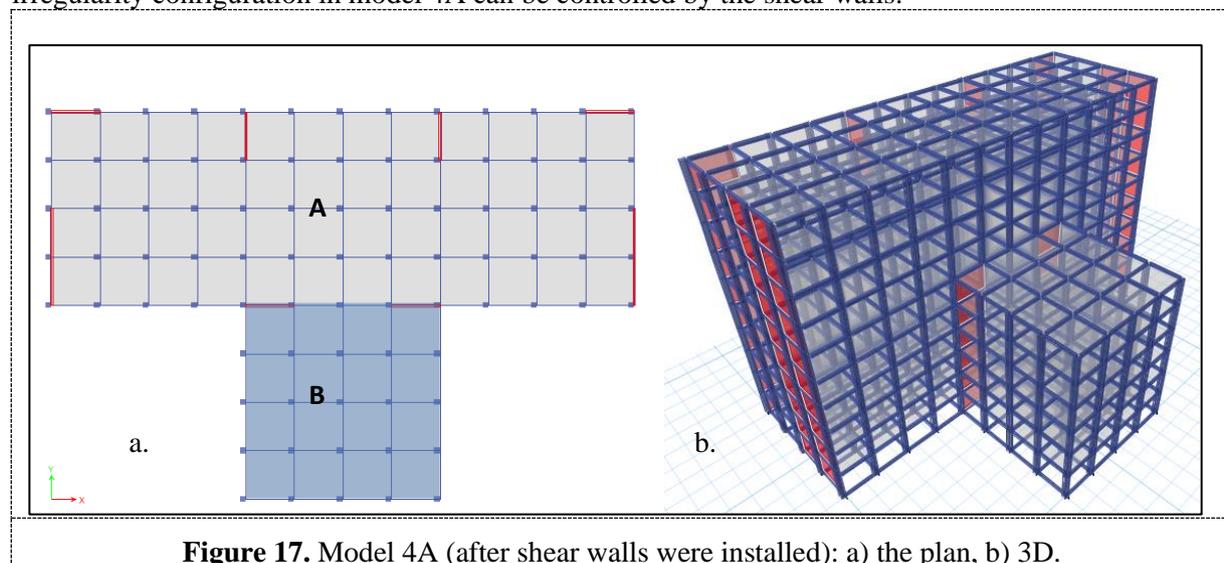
Model 4A (after shear walls were installed): a) the plan, b) 3D.
